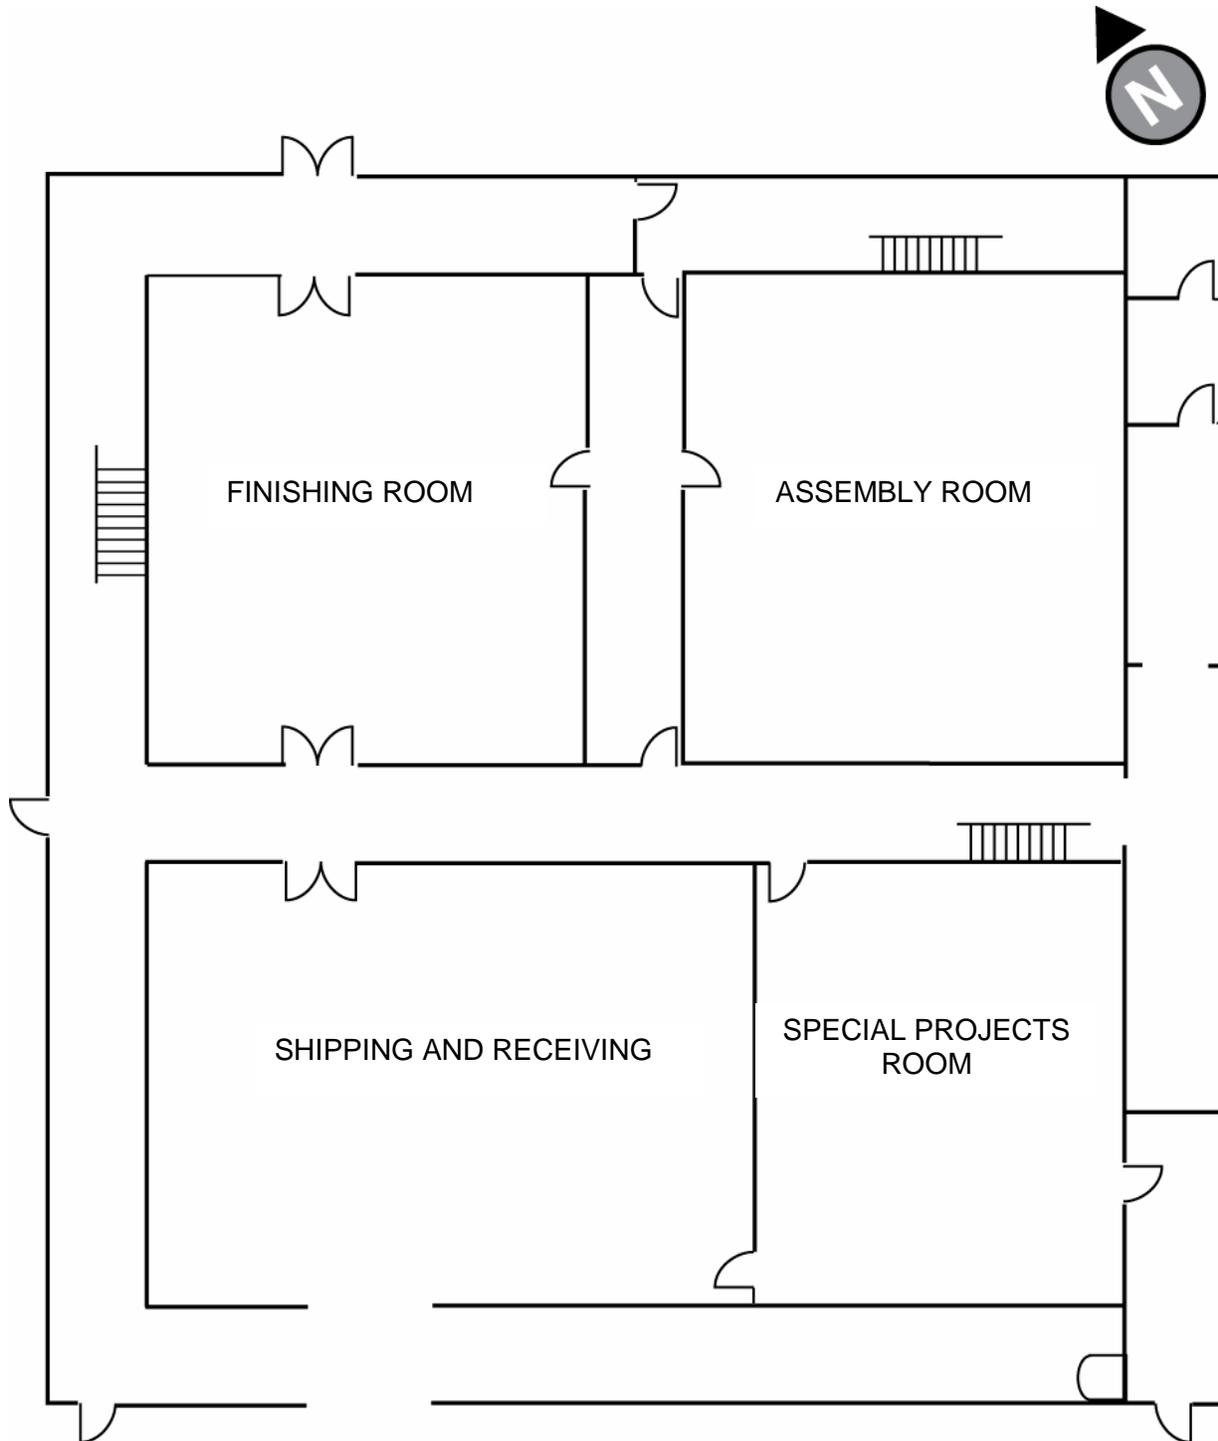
Floor Plan for Building 9825H, Special Projects Building, 1st Floor
